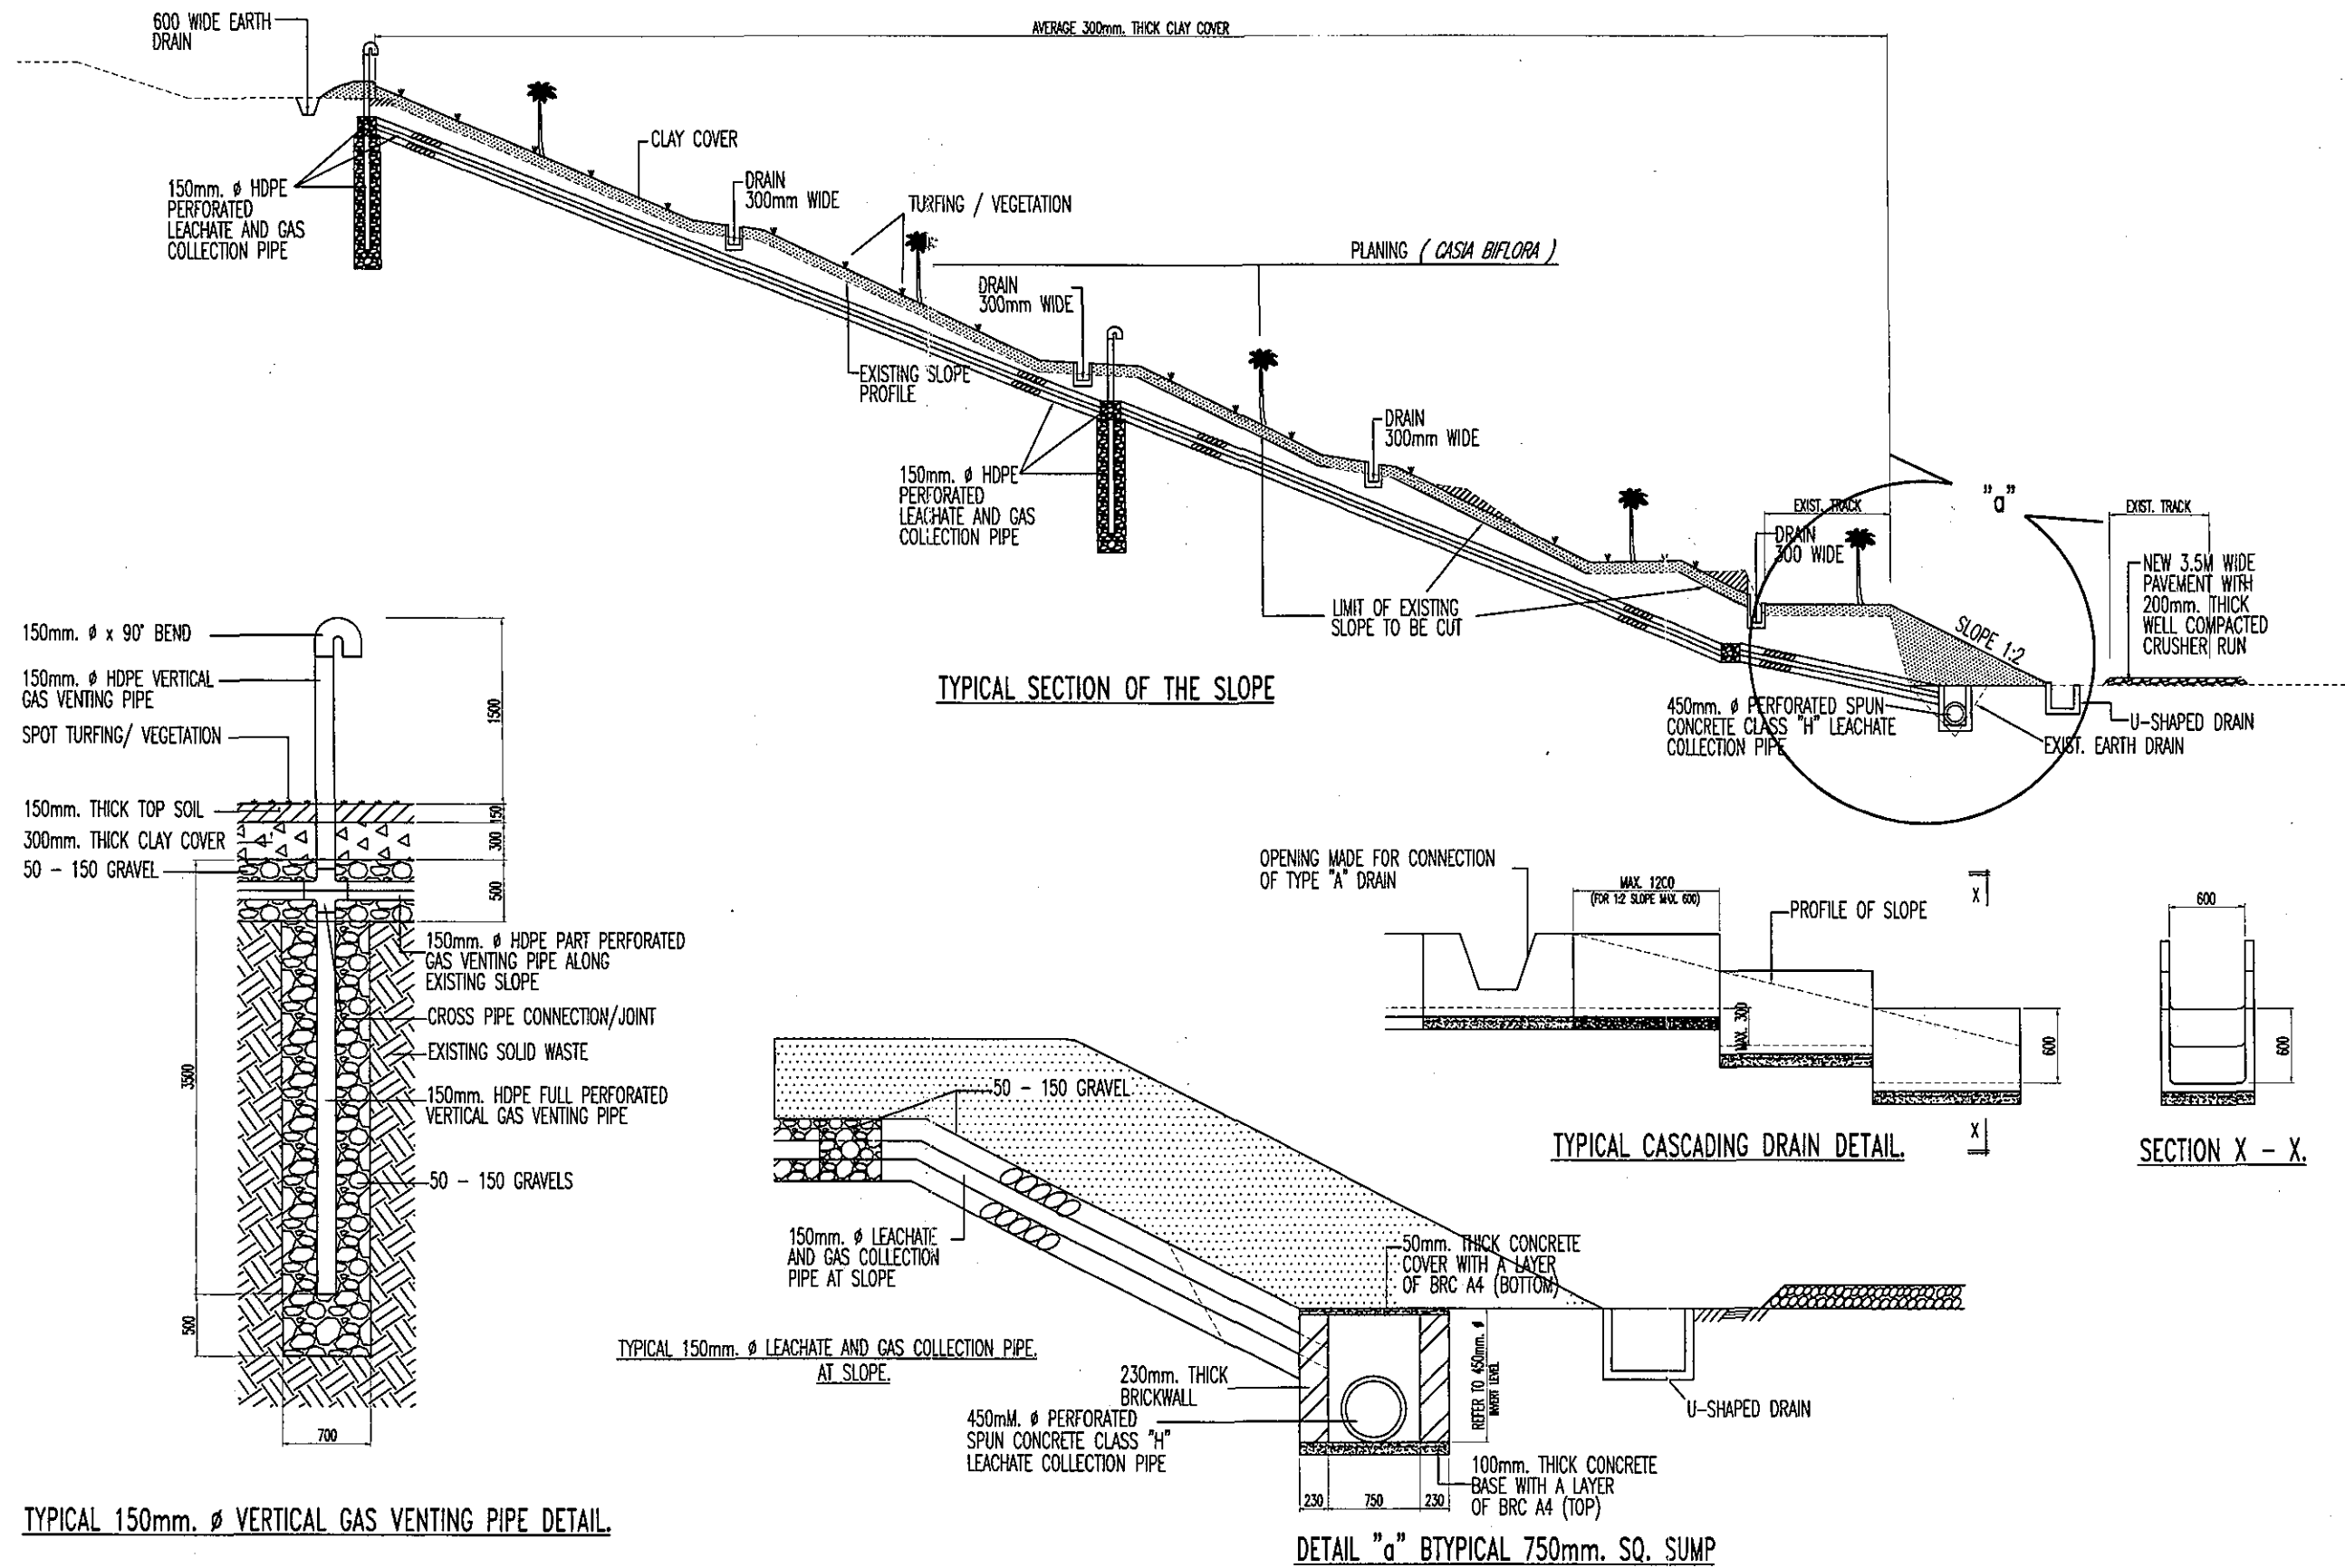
Typical Sections (Ampang Jajar Pilot Project)
